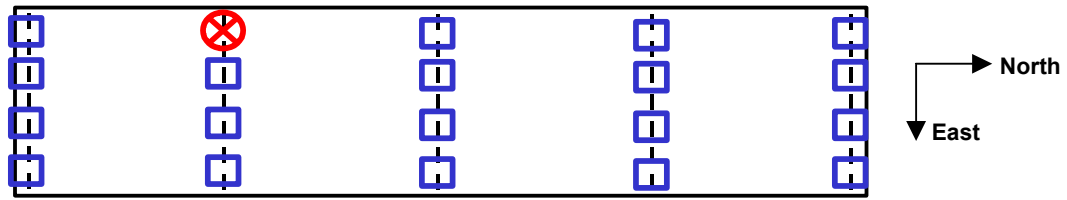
Locations of failed puddle welds after Test #6 (DDR = 0.61 %)
